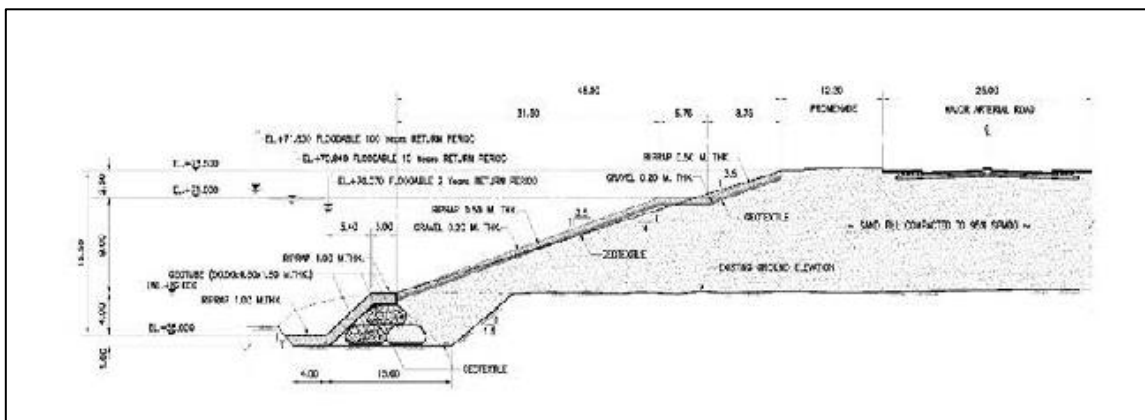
Section of Waterfront (riprap geotube + riprap) Alternative 5
